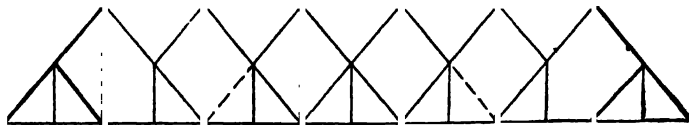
Petit Truss with Sub-ties and Parallel Chords (Baltimore Truss).
